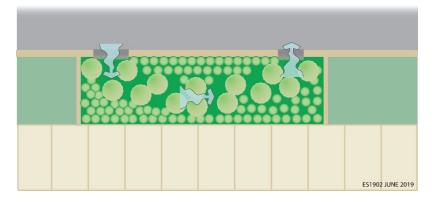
Curb Extension or Facility Extending Beyond the Curb (Plan View)
